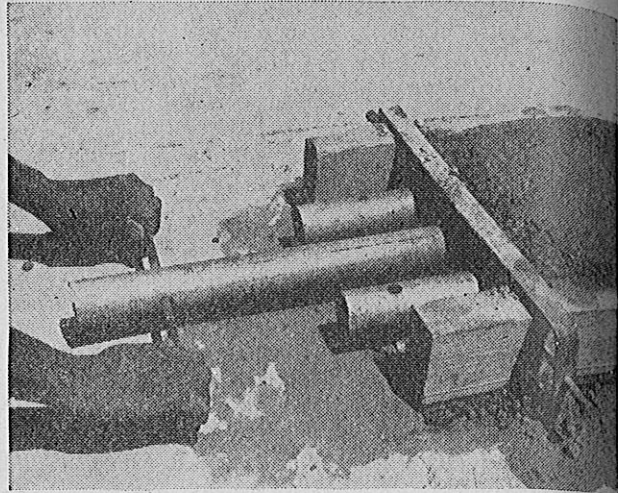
Drawing the galvanized iron pipes out by gently rotating them with the help of a short lever. This was done less than an hour after the concrete was cast
